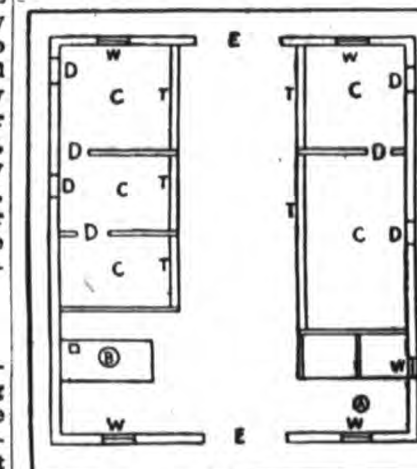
FLOOR PLAN OF HOGHOUSE.
